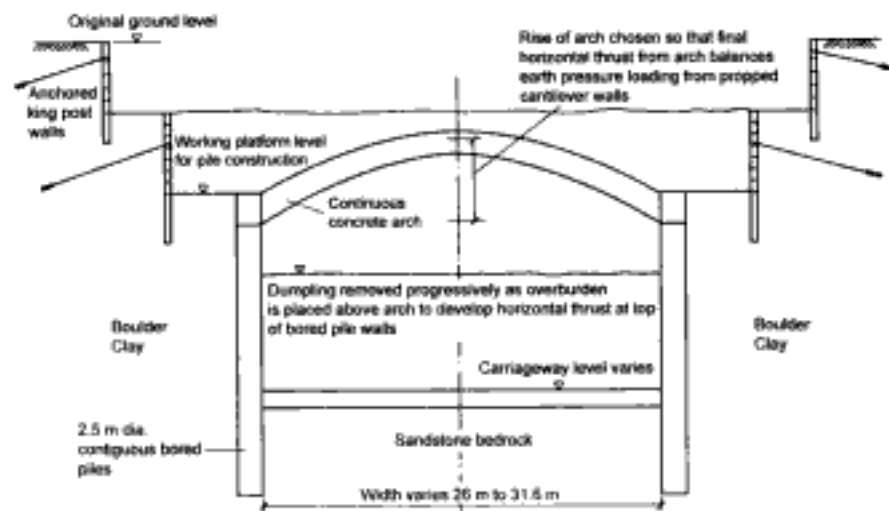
Vertical cross-section of cut-and-cover structure, Liverpool Kingsway Tunnel; contiguous bored pile walls propped by concrete arch (after Megaw and Brown⁸)
